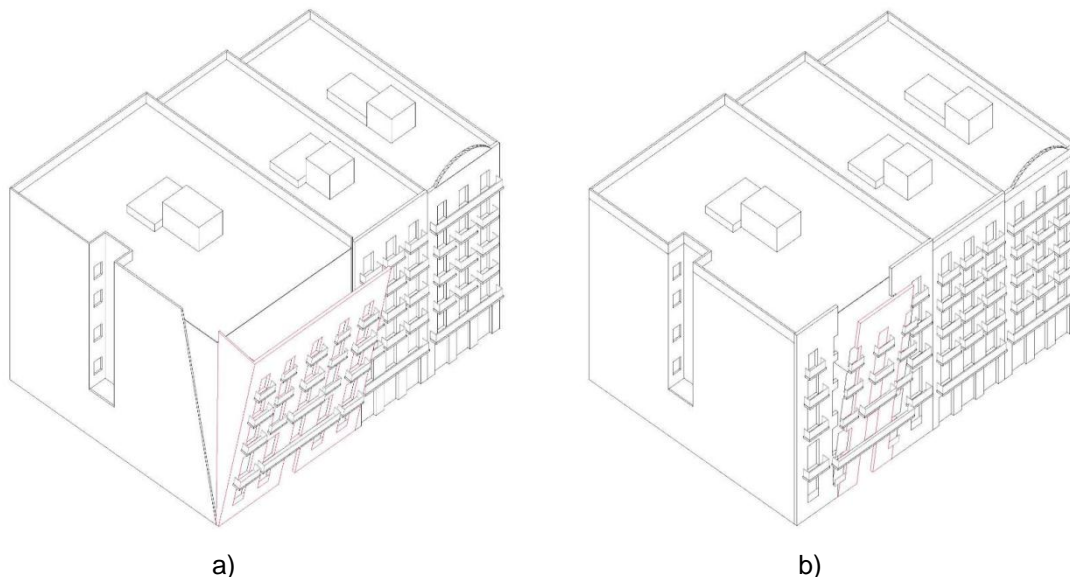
Two out-of-plane façade mechanisms for a typical unreinforced masonry building (NIKER D3.1, 2010)
